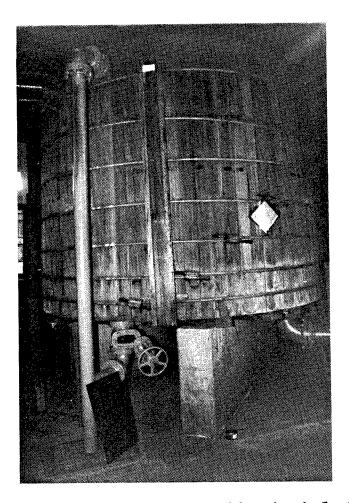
Building 6707-2: Wooden water storage tank located on the first floor.
